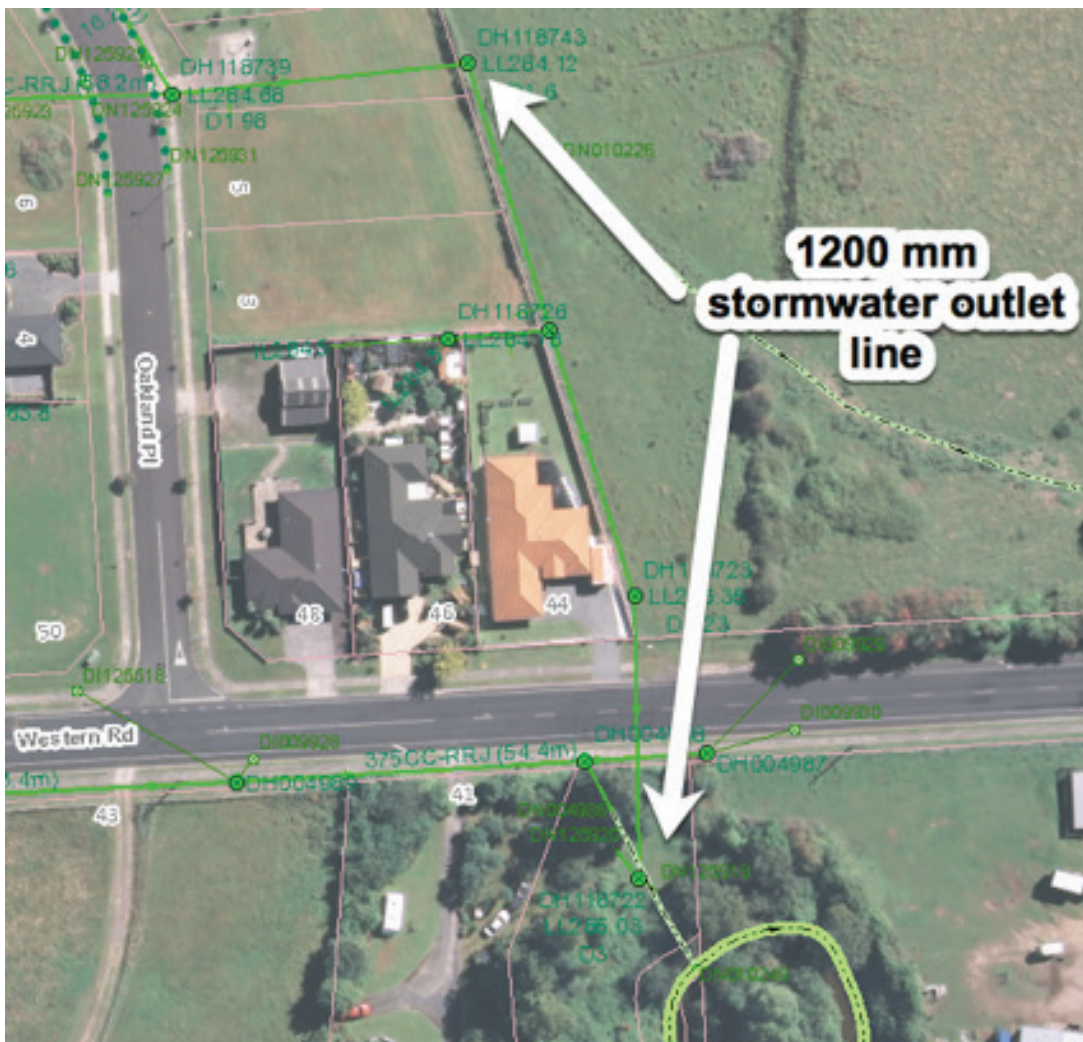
Plan view of 1200 mm stormwater outlet line from PPTS development
